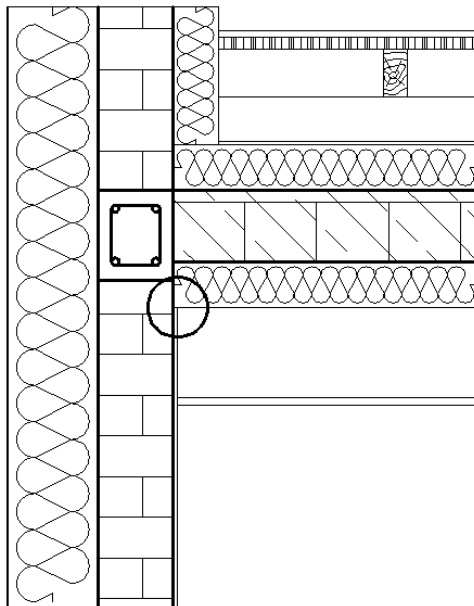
Location of the Thermal bridge in the connection of the exterior wall with the roof slab. [66]
